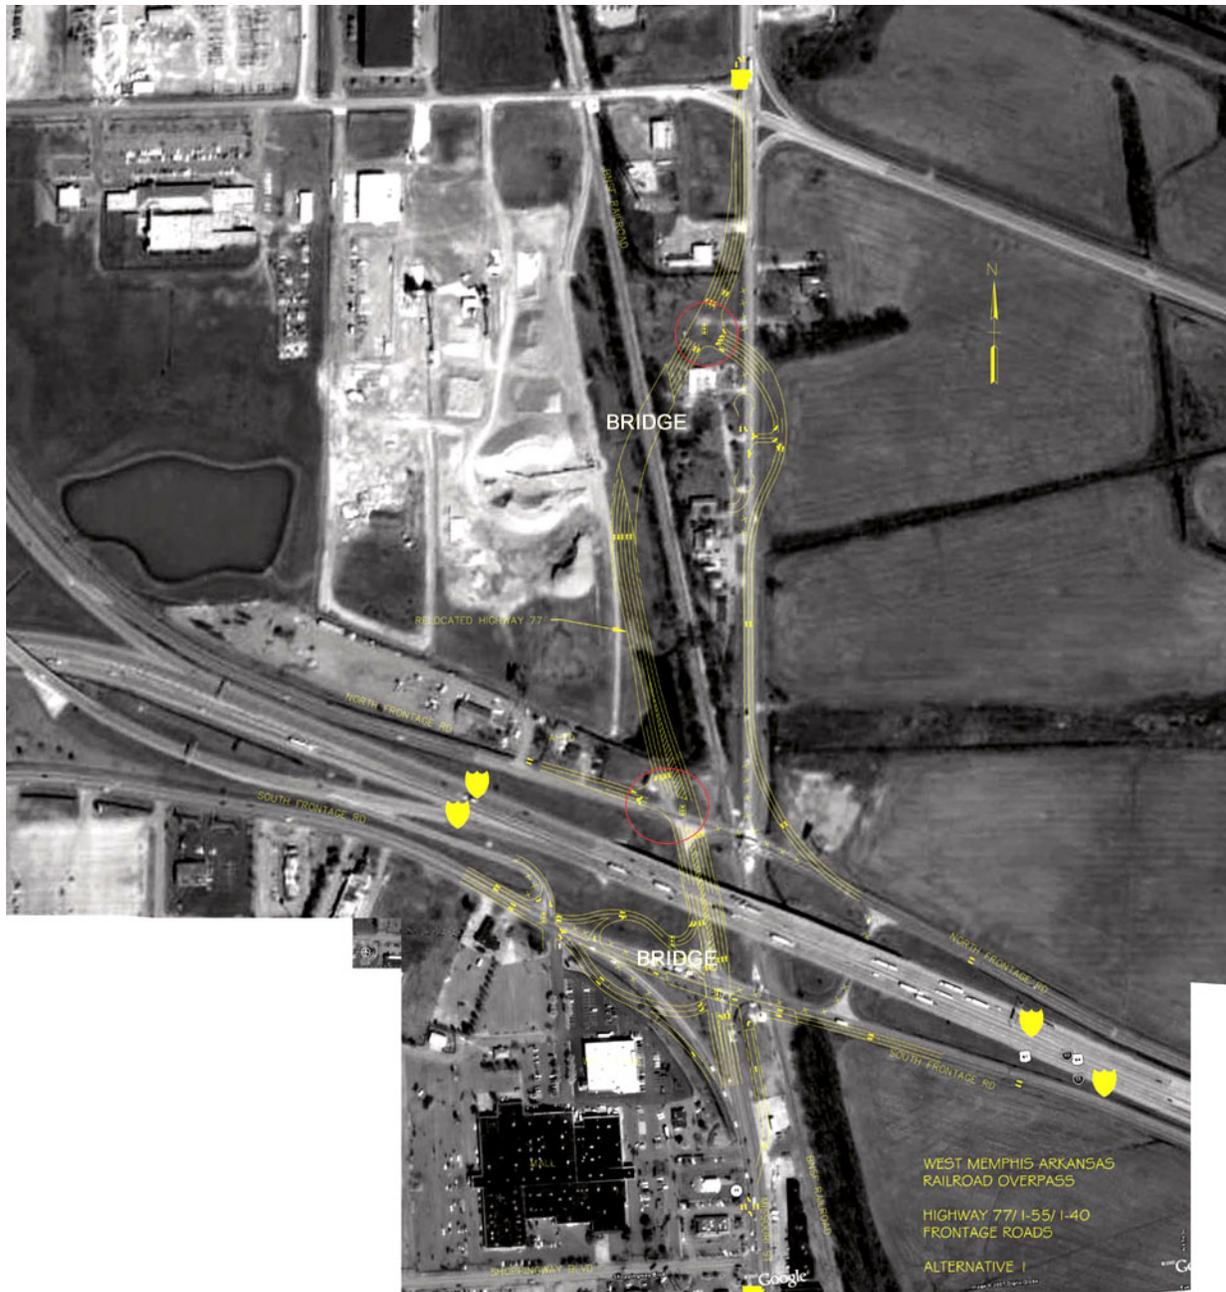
Parson Engineering Alternative 1 with roundabout study locations marked with red circles. Note proposed bridges over the railroad to mitigate present queuing problems . (Plan source: West Memphis – Marion Area Railroad Overpass Study for AHTD by Parsons Corporation, Memphis, Tennessee, November, 2005)
